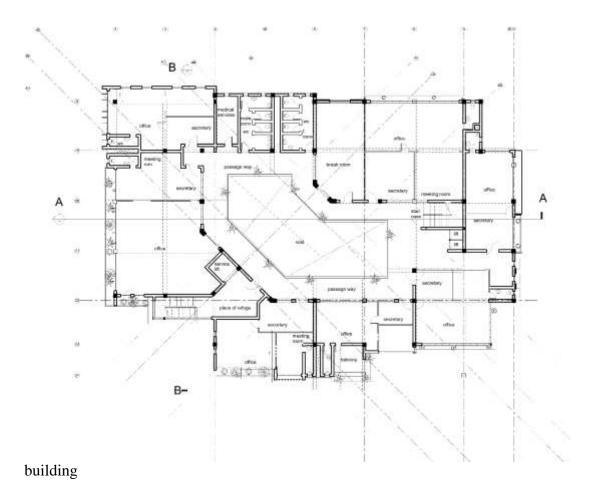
Proposed 8th floor plan for office complex Source: Authors' design (2020)
